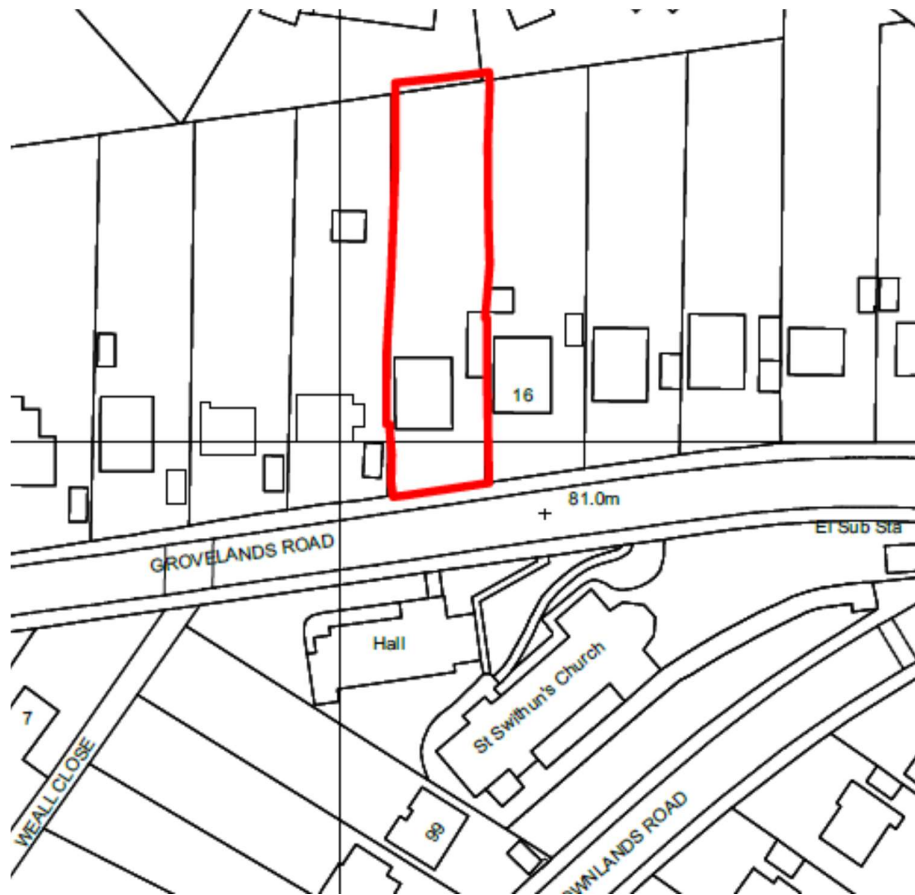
Aerial street view highlighting the proposed site within the surrounding street scene.
